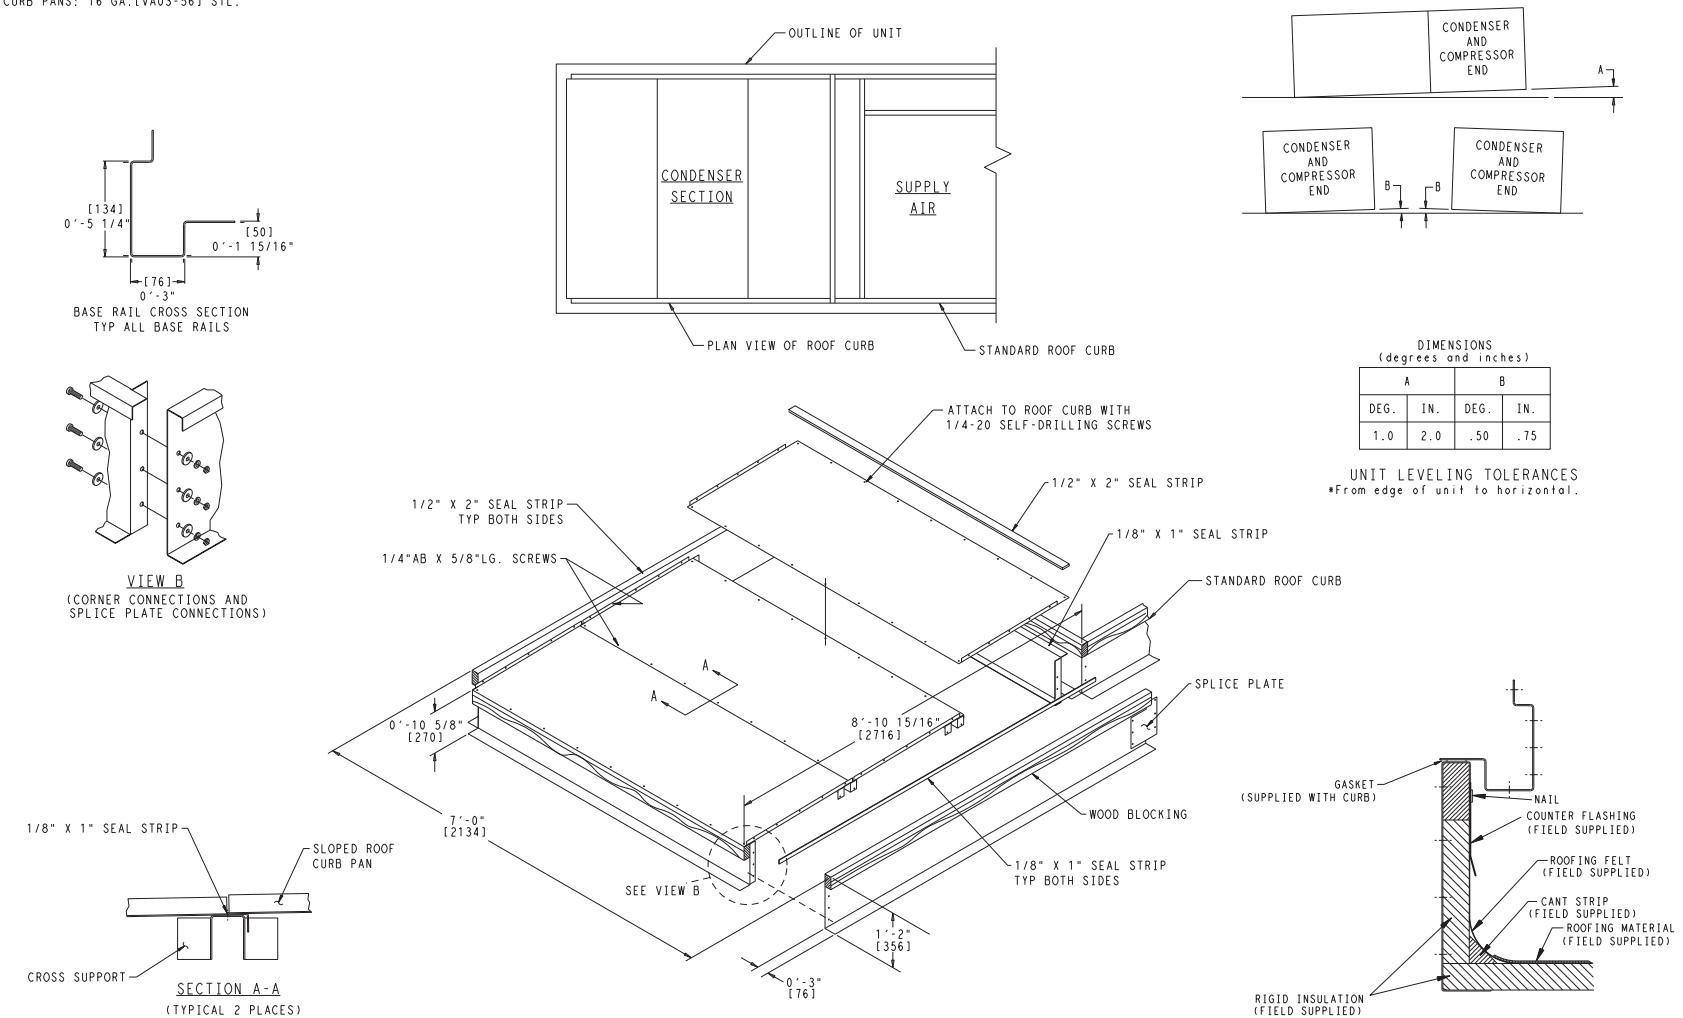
Condenser Section Roof Curb (Sizes 070 and 075)
